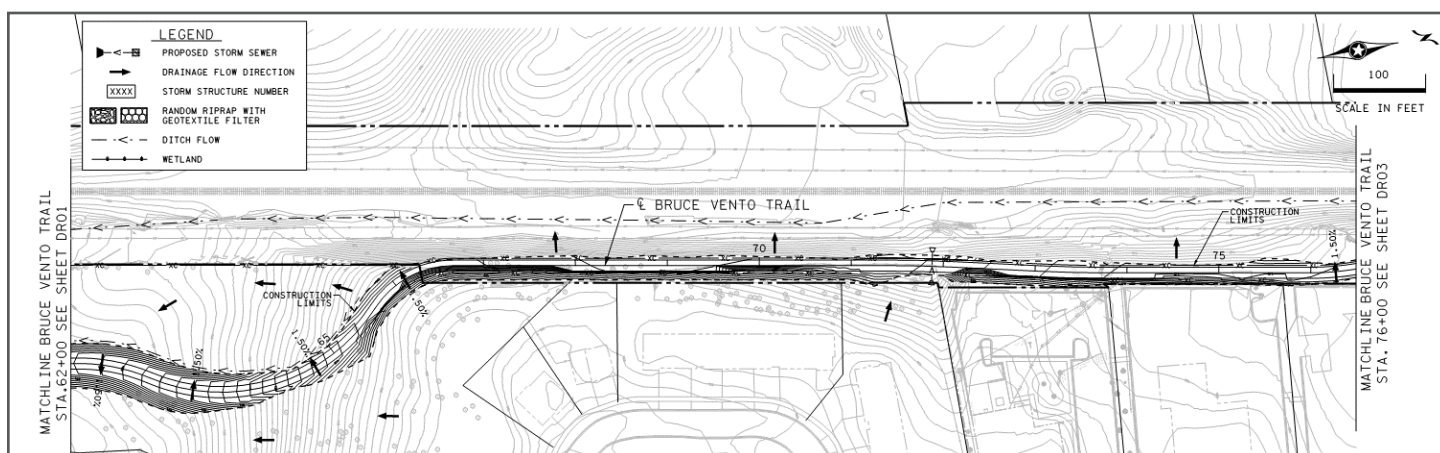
A Plan Sheet Example of the Bruce Vento Trail Segment 3 Construction Plans Showing the Relationship of the Bruce Vento Trail to the BNSF Rail Corridor Along with Grading and Drainage Construction Requirements
